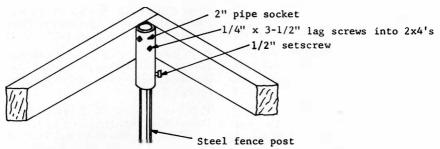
Details of socket used to attach the shade frame to the steel fence post supports.
